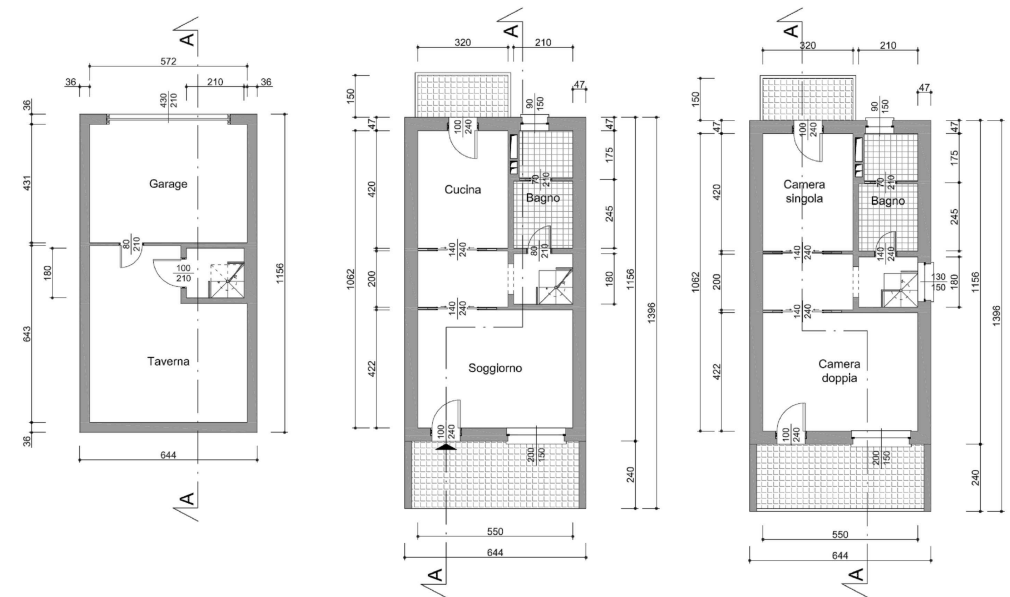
House plans for basement (left), ground (middle) and first floors (right).
